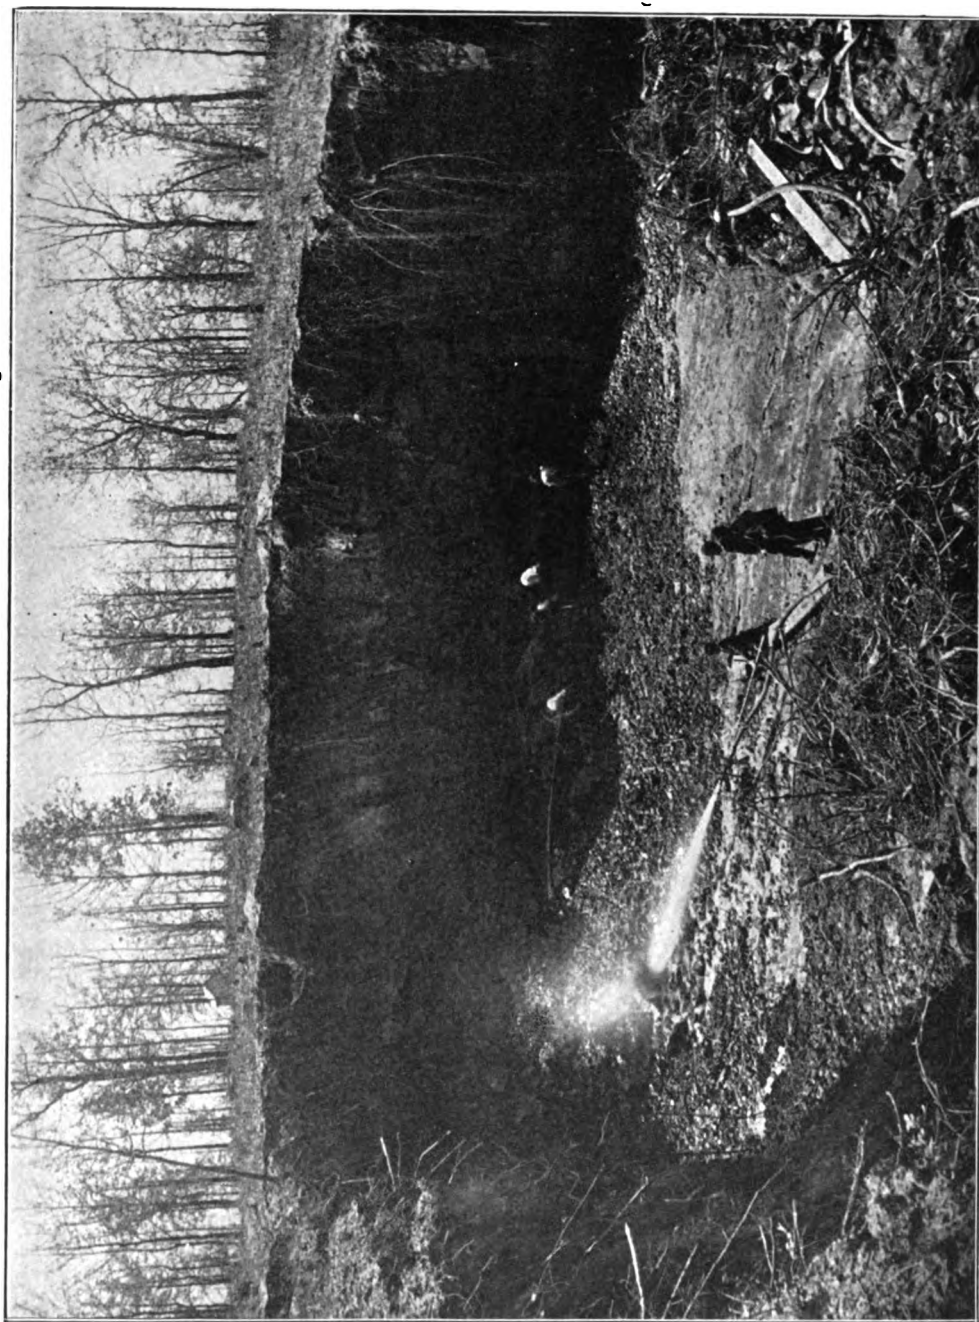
HYDRAULIC SLUICING FOR BUILDING DAM AT TYLER, TEXAS.
